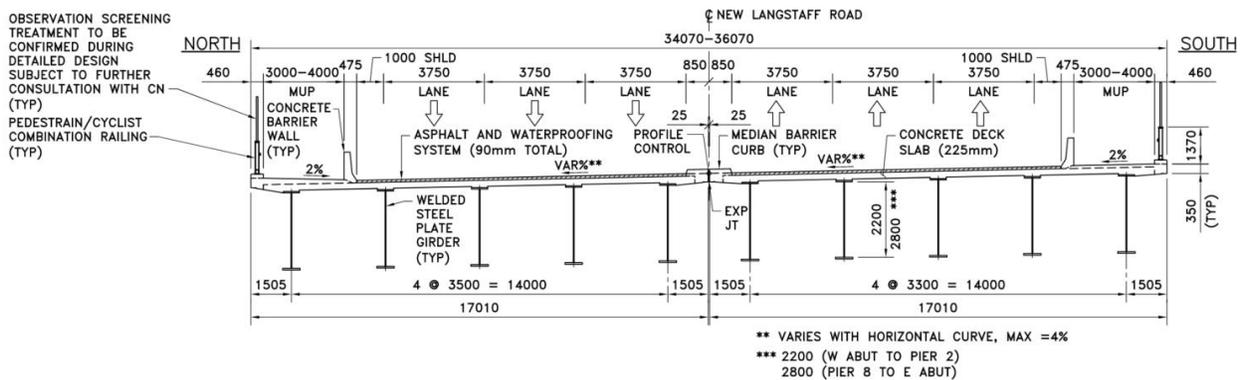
Proposed Cross Section – Approach Spans – Steel I Girder
